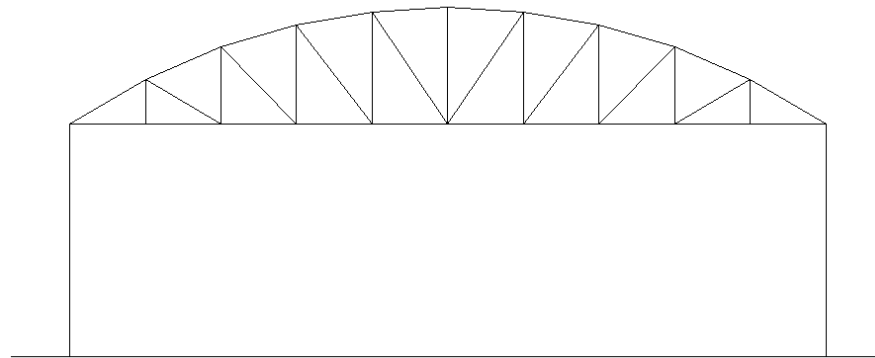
Wood Truss Configuration with Top Chord Separated Into 10 Members
